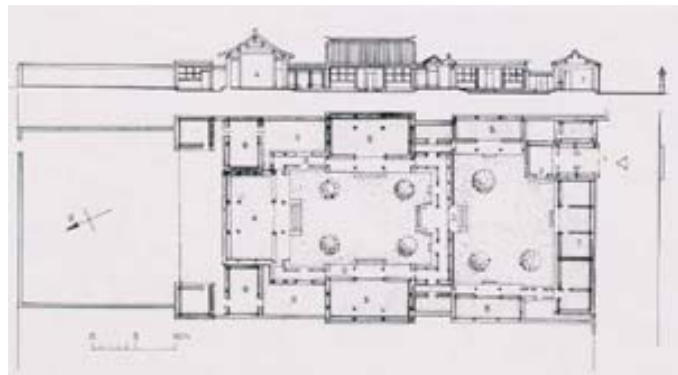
Typical plan and elevation of Shiheyuan housing.
